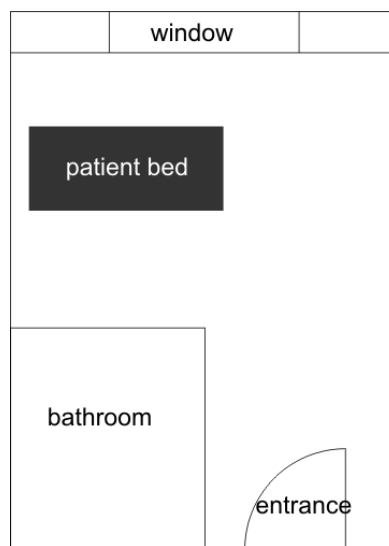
Inboard Bathroom Layout. Image Credit- Author.
